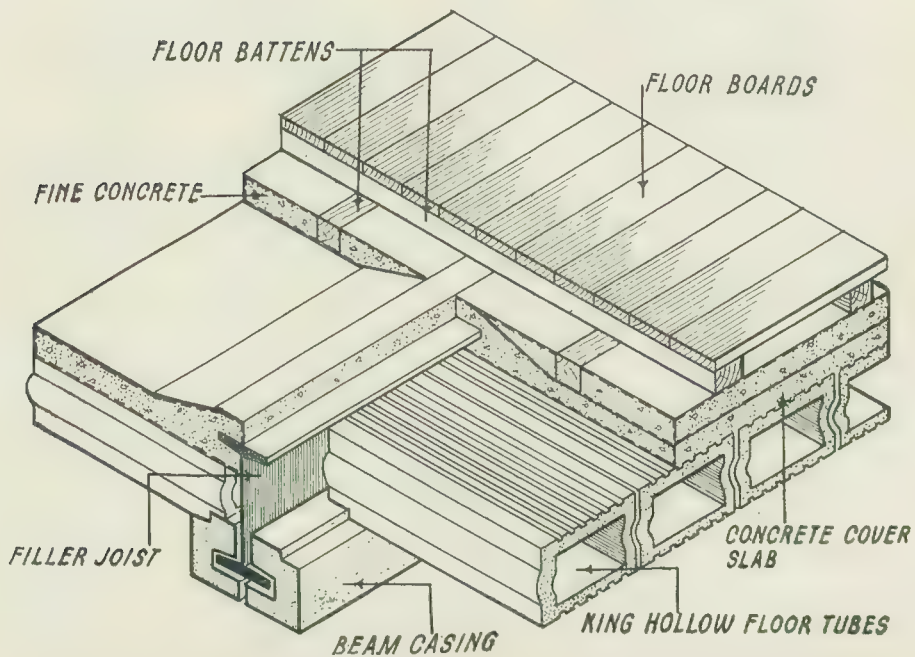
ENCASING SECONDARY FLOOR BEAMS WITH BURNT CLAY BLOCKS
